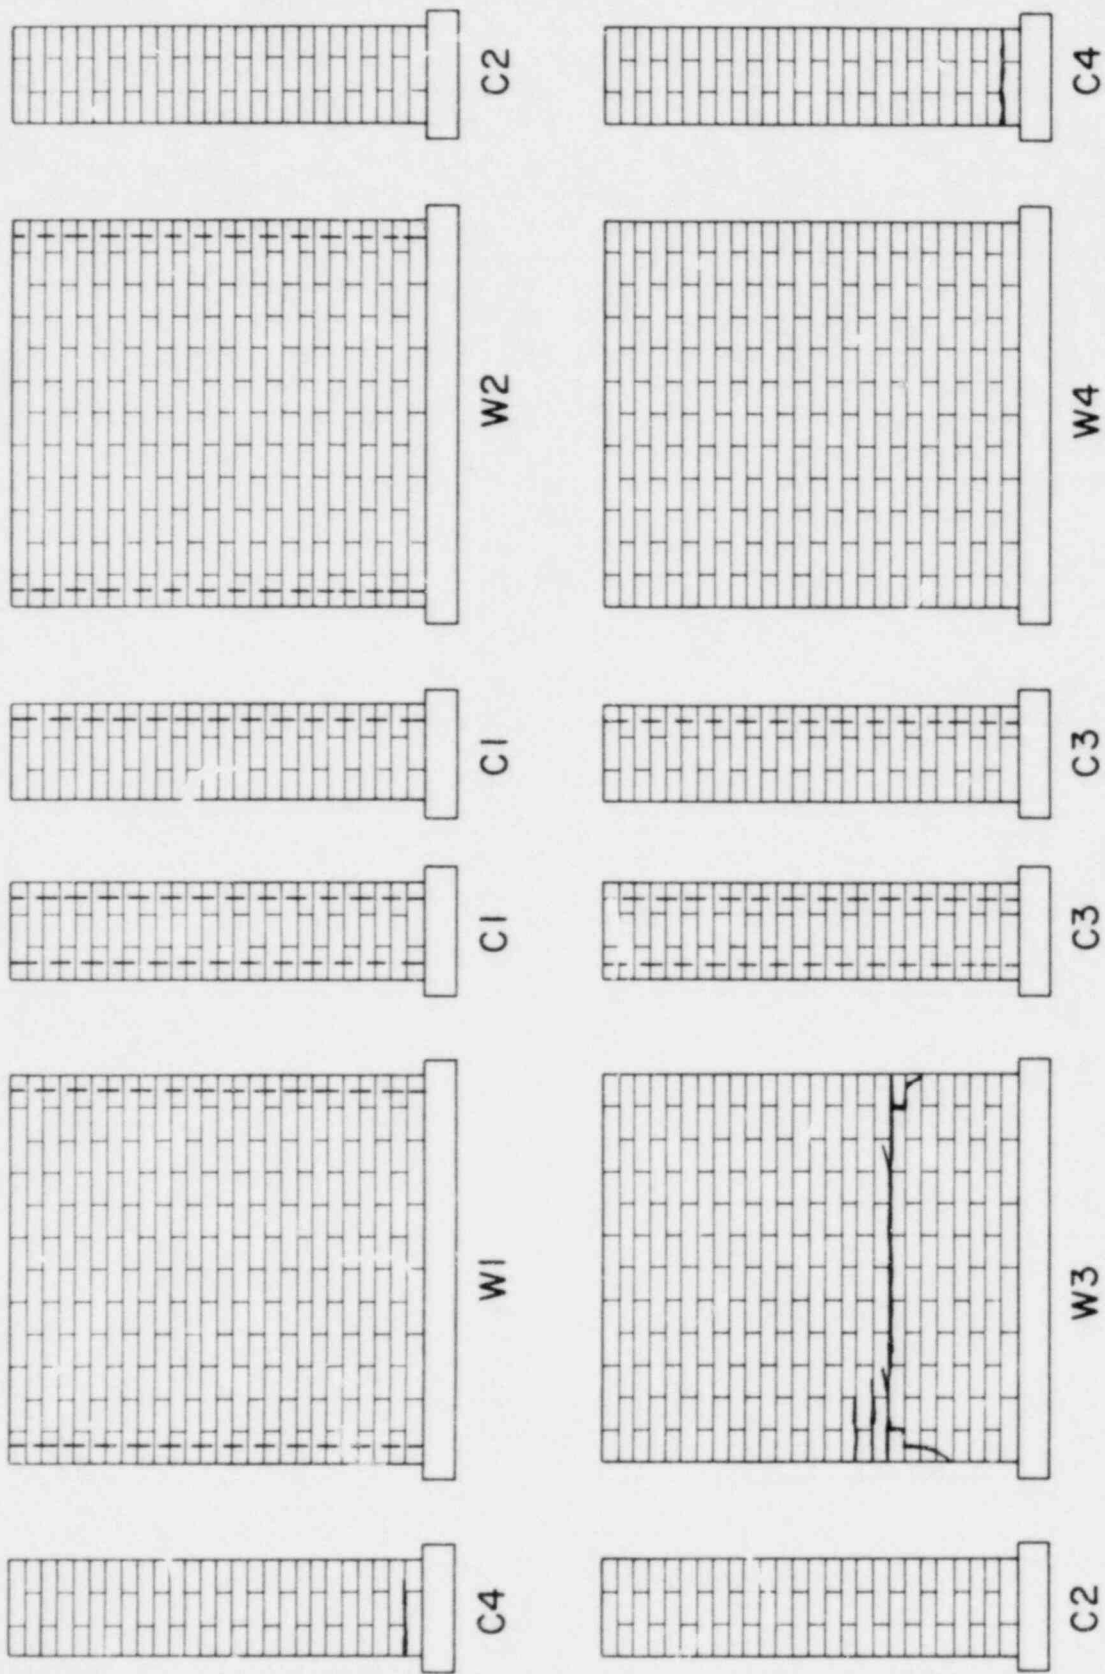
(c) DISTRIBUTION OF CRACKS IN THE MASONRY COMPONENTS: HOUSE 1, AFTER TEST 10 (TAFT - 0.27 g)
